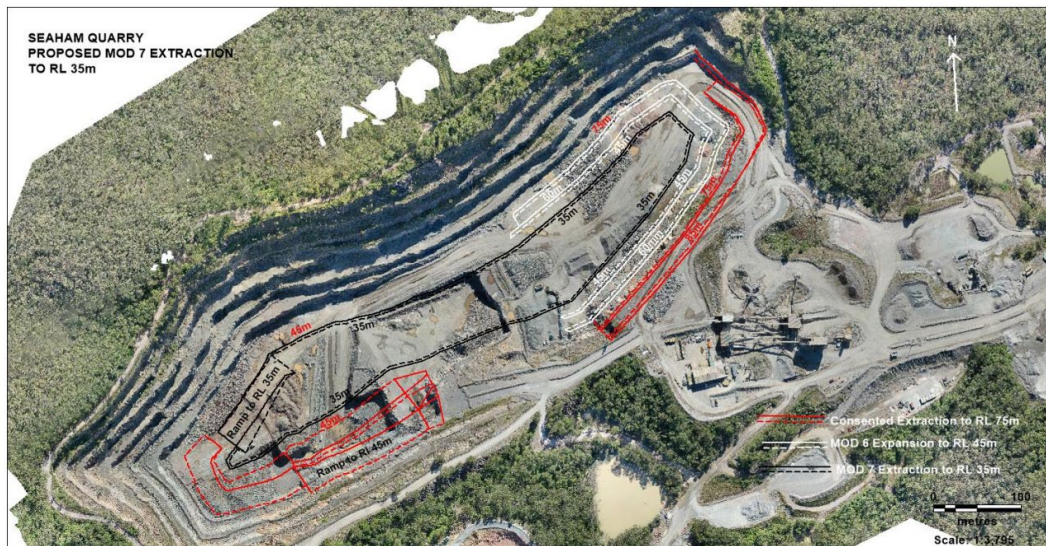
Proposed Pit Lowering Plan (Source: Applicants documentation)
